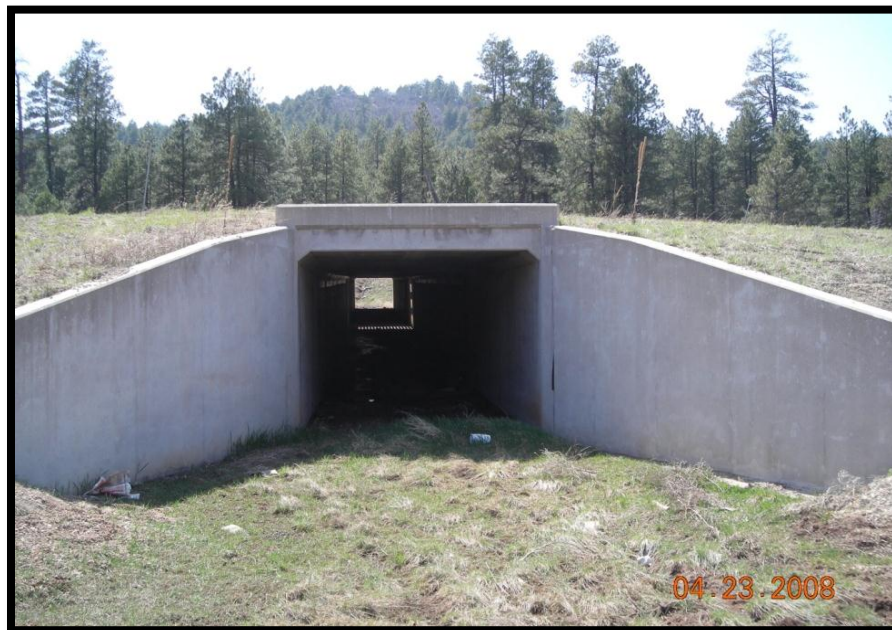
8x7-foot box culvert at Skeleton Park, looking west
